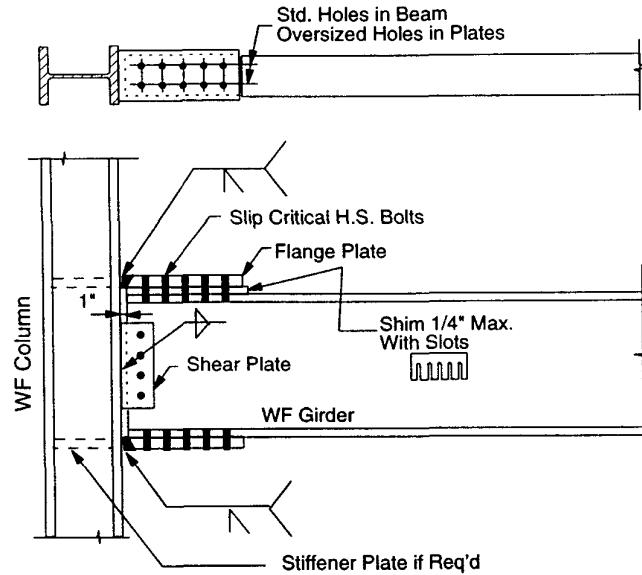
A Typical Top- and Bottom-Plate Moment Connection
